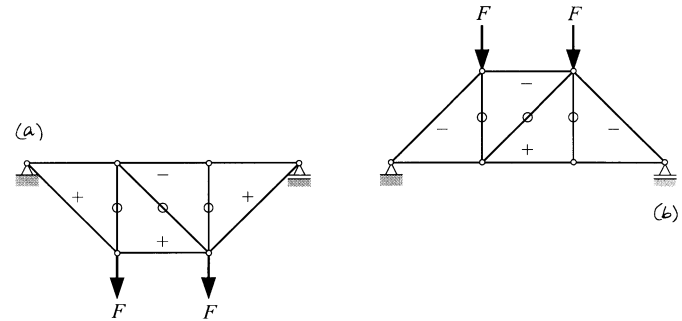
The bar structures in Figure 14.58 changed into trusses.
